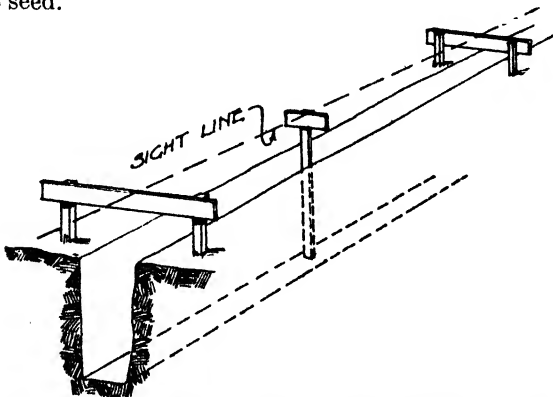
Setting out a Trench, with two sight rails and boning rod.
